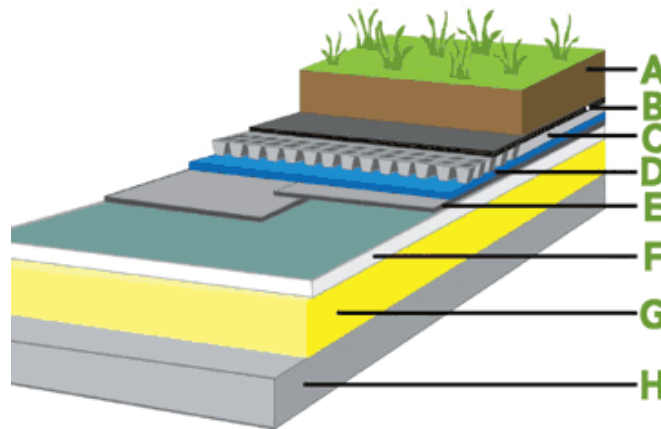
NationsRoof green roof section: A -Growing Medium & Plants, B - Moisture Retention Mat, C - Drainage Layer, D - Protection Fabric/Root Barrier, E - Waterproofing Membrane, F - 1/2" DensDeck Prime®, G – Insulation, H - Structural Deck
